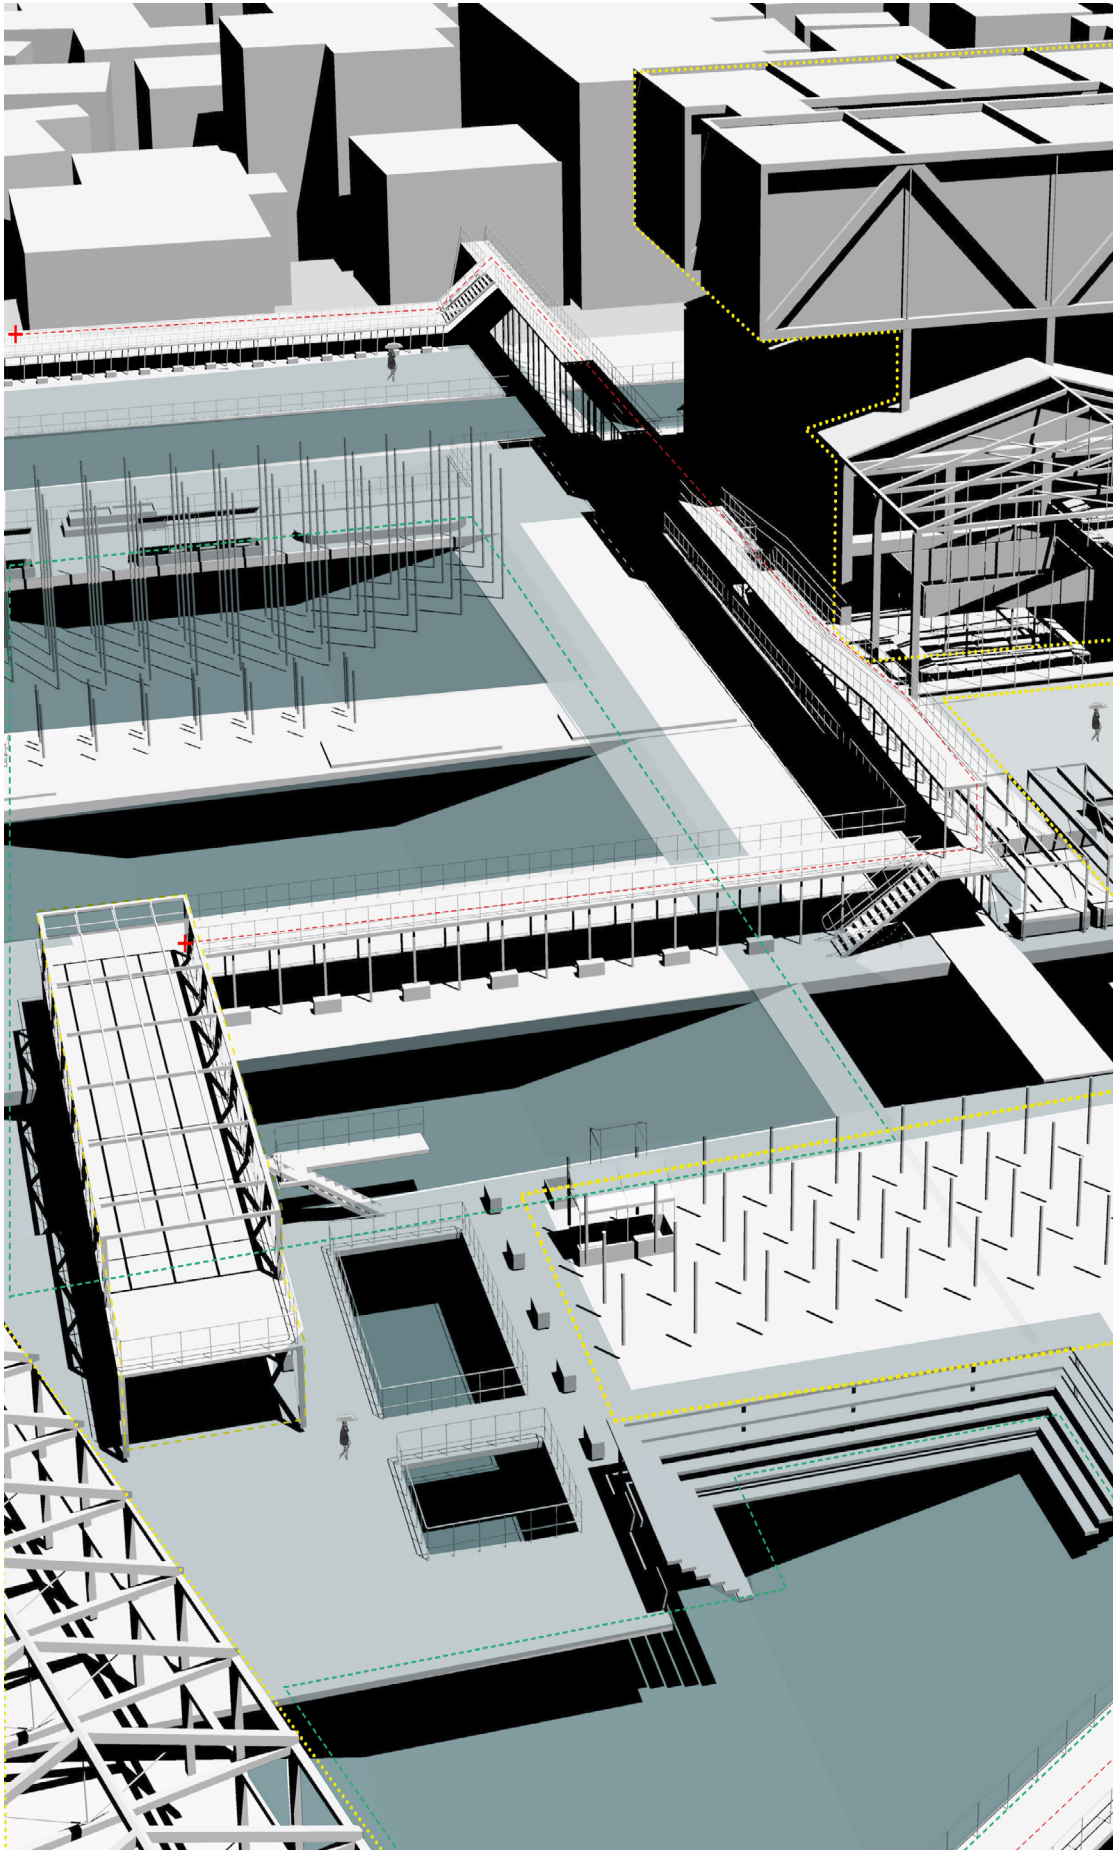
Site B Perspective 2 of post-industrial neighbourhood showing raised building components over flooded urban pond
